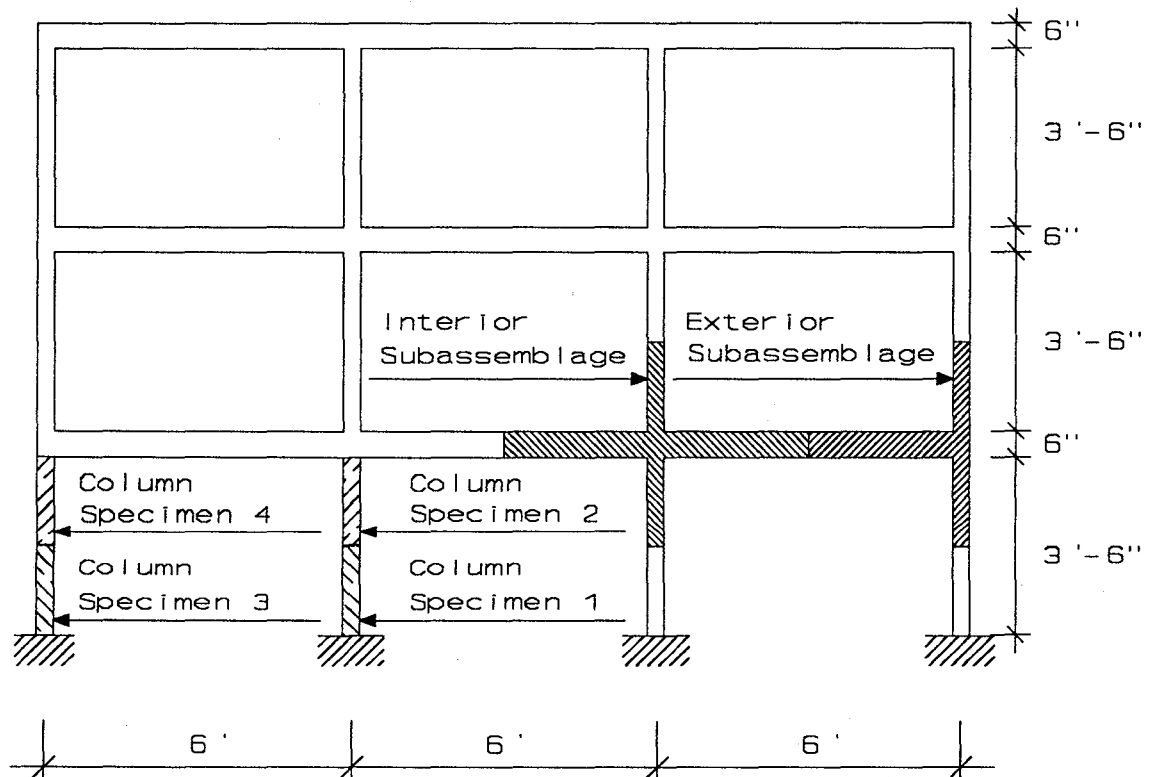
Identification of Column Specimens and Beam-Column Subassemblages
